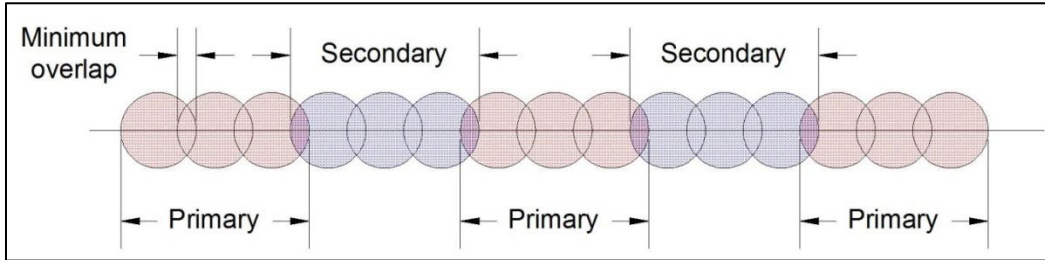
Typical construction sequence of primary and secondary columns for a DSM cutoff wall using an overlapping triple auger system.
